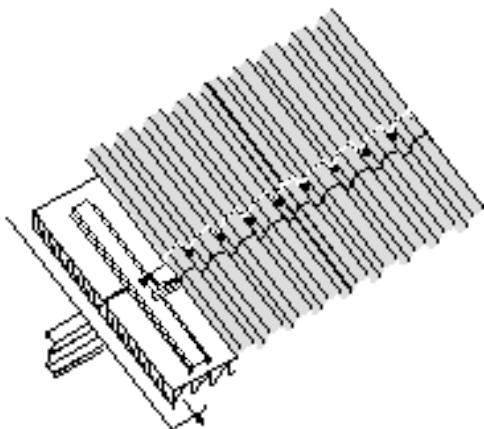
A liner tray under profiled metal roofing with separate thermal insulation
